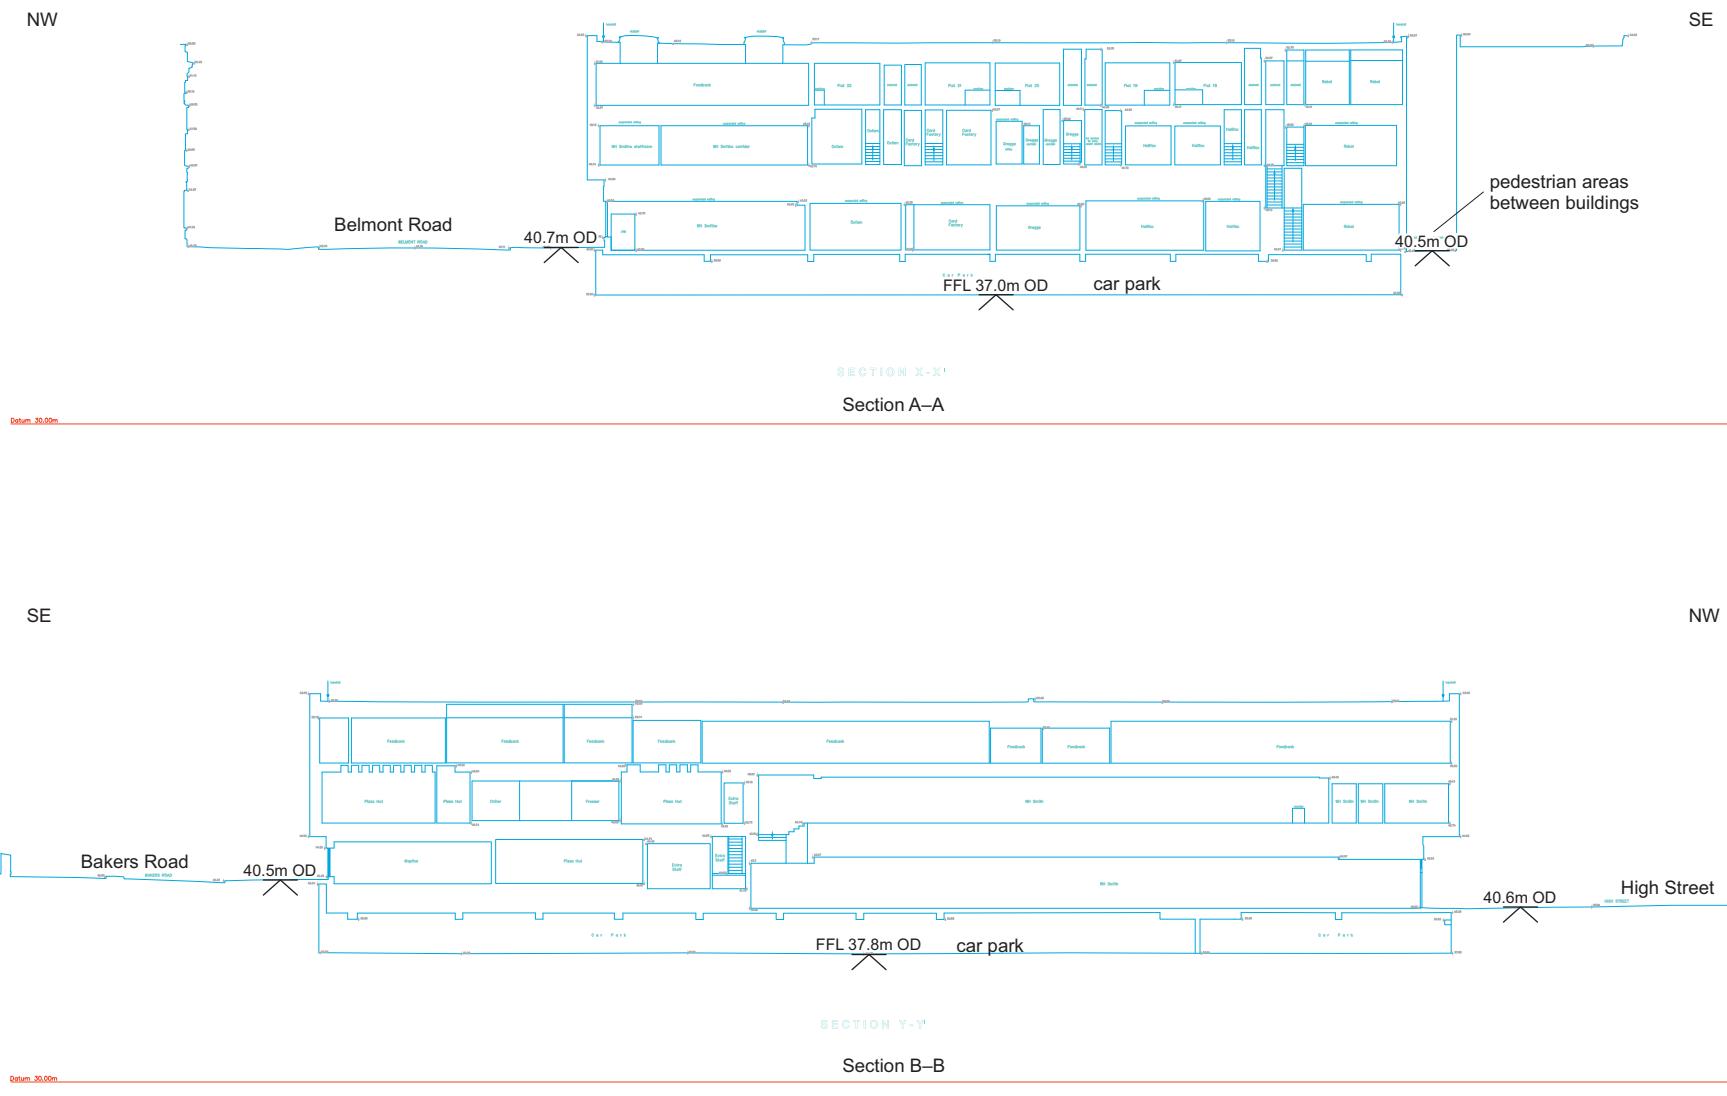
North-east and south-east facing sections of the existing site (Terrain Surveyors Limited, Drawing No. TS16-340T\3, September 2016)
